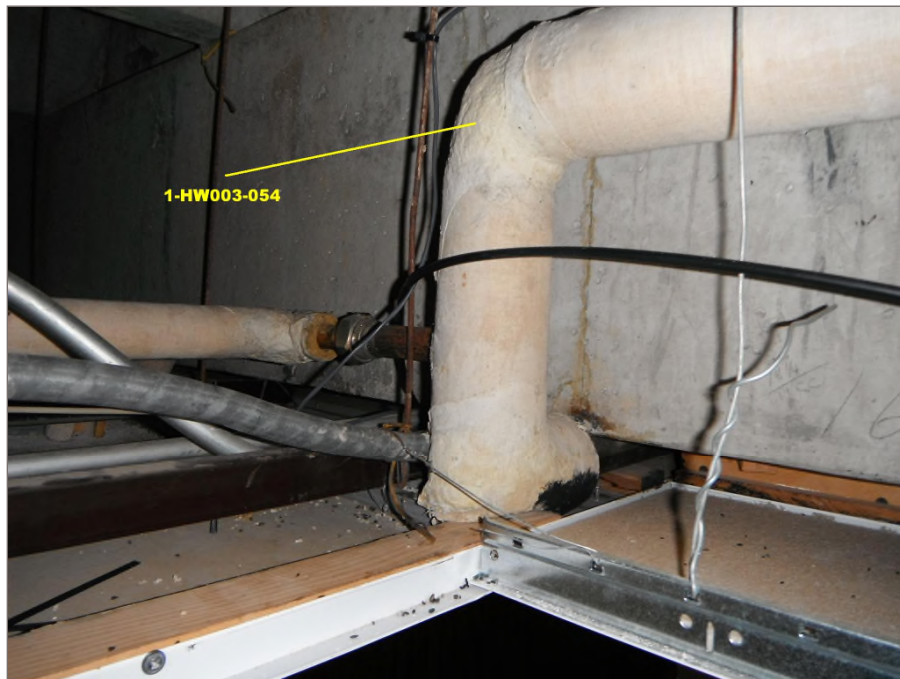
Asbestos-containing mudded insulation applied to the elbow of a 4" diameter pipe within the ceiling space of the first floor hallway. Tetra Tech sample 1-HW003-054.
